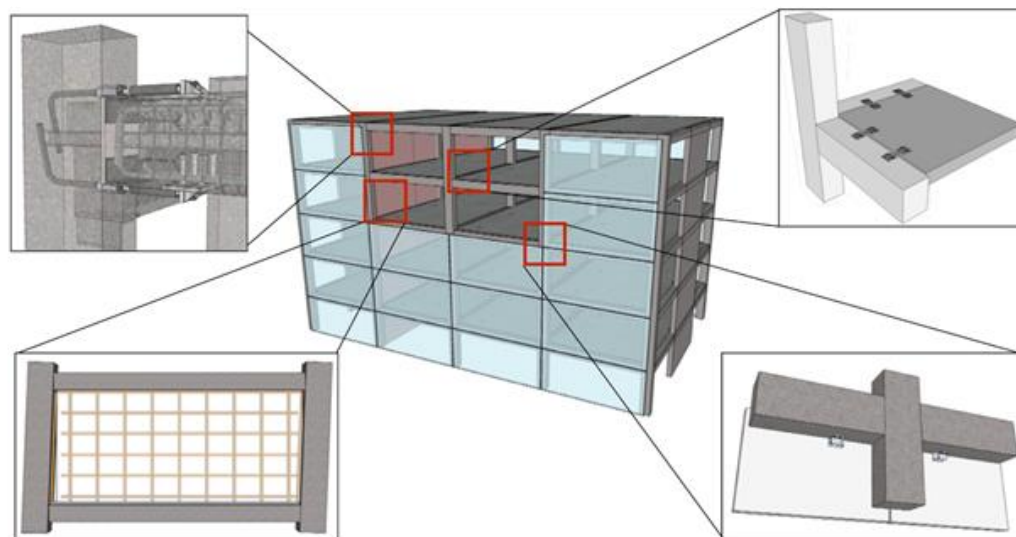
Concept of integrated (structure/skeleton including floor/diaphragms, and non-structural/envelope) low-damage building system (after Johnston et al., 2014)
